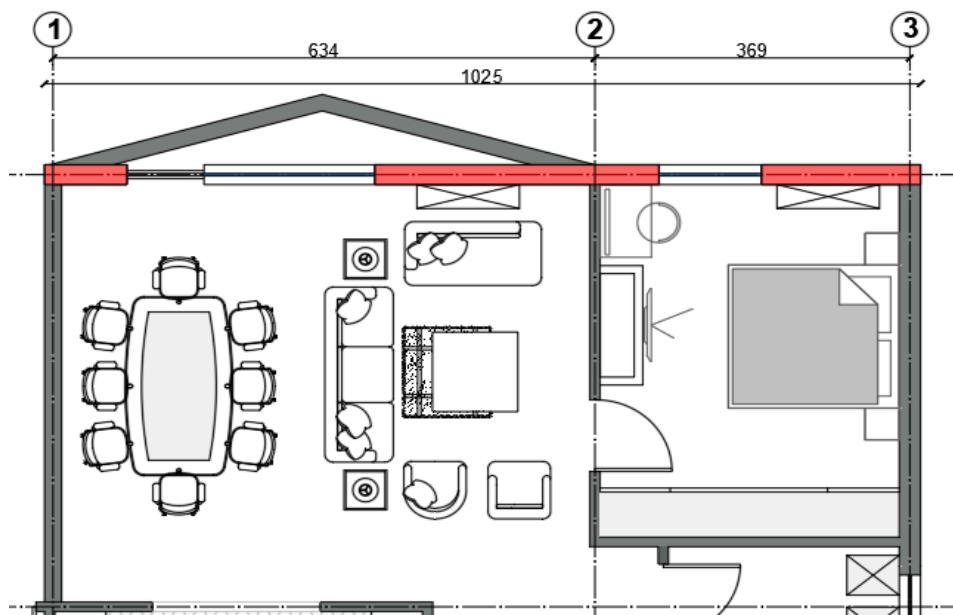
Floor plan of the apartment (Building A). The measurements were performed on the perimeter wall showed in red. Source: Authors
